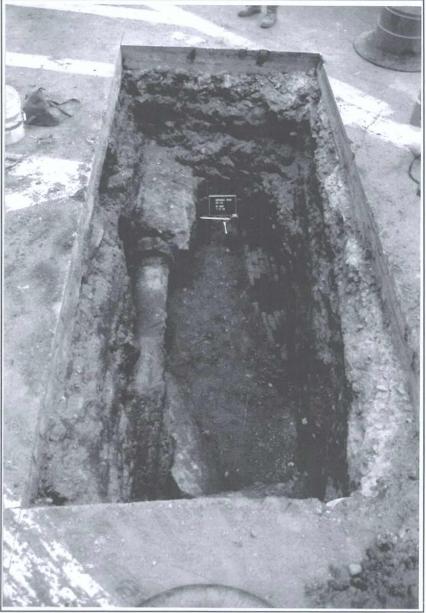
Test Pit 3A at a Depth of Approximately 5.5 Feet Below Grade, Showing Top of Abandoned Brick Sewer (Right) and Later Utility Line (Left). Scale is 1 Foot Long. View to South.
